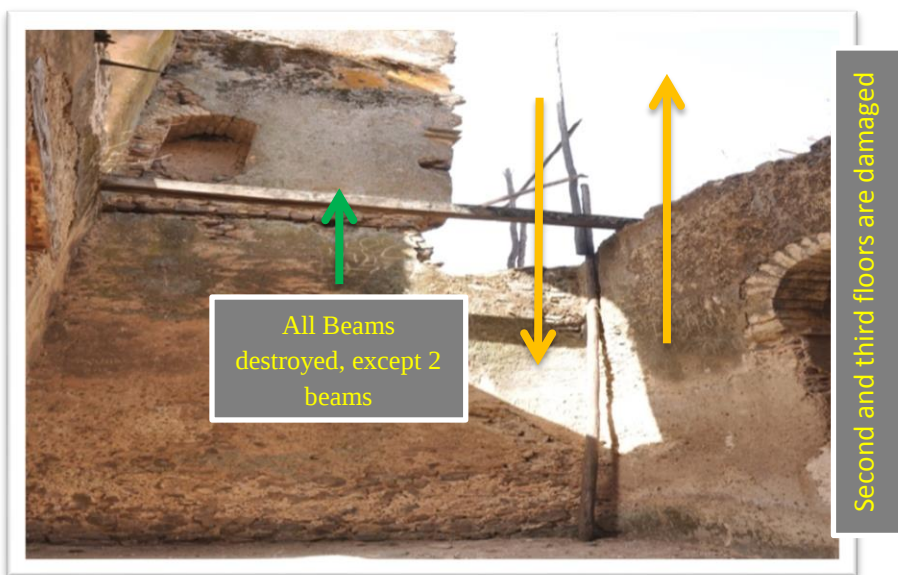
Damaged second and third floors of the Palace (Photo by Kedir 2018)
